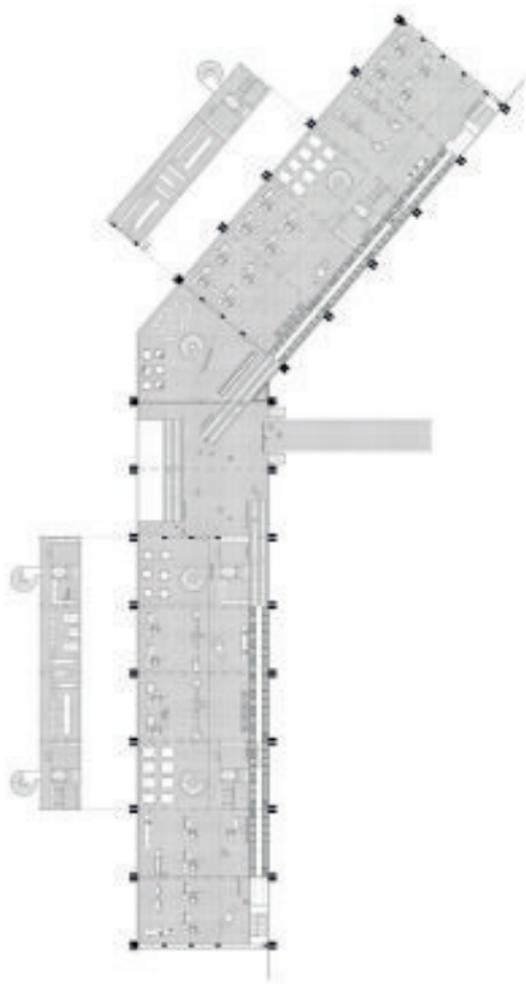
FLOOR PLAN (SOURCE: ARCHITECTS)
